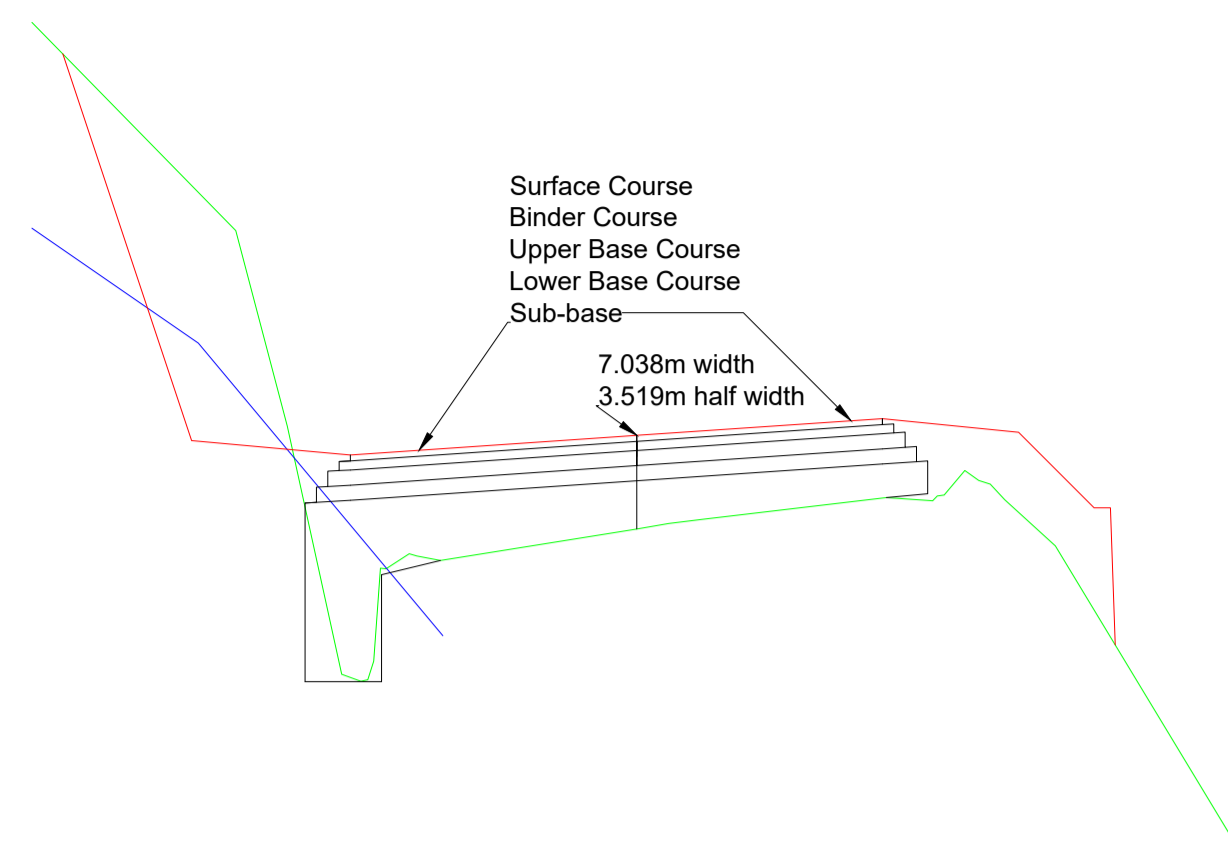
DETAILED DESIGN CONSTRUCTION CROSS SECTIONS SHEET 2 OF 10
